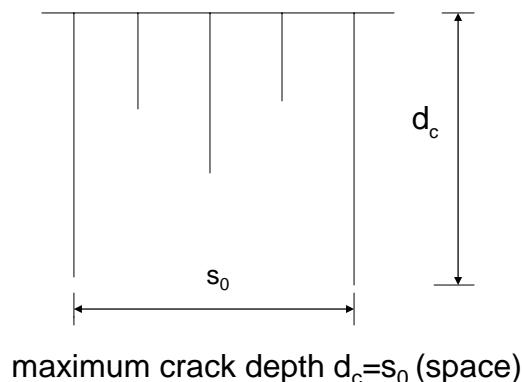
Typical Desiccation Crack Pattern in a Soil Mass.
